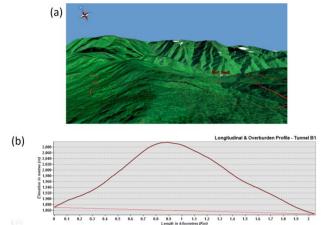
(a) 3D-view and (b) longitudinal profile of B-1 tunnel section
